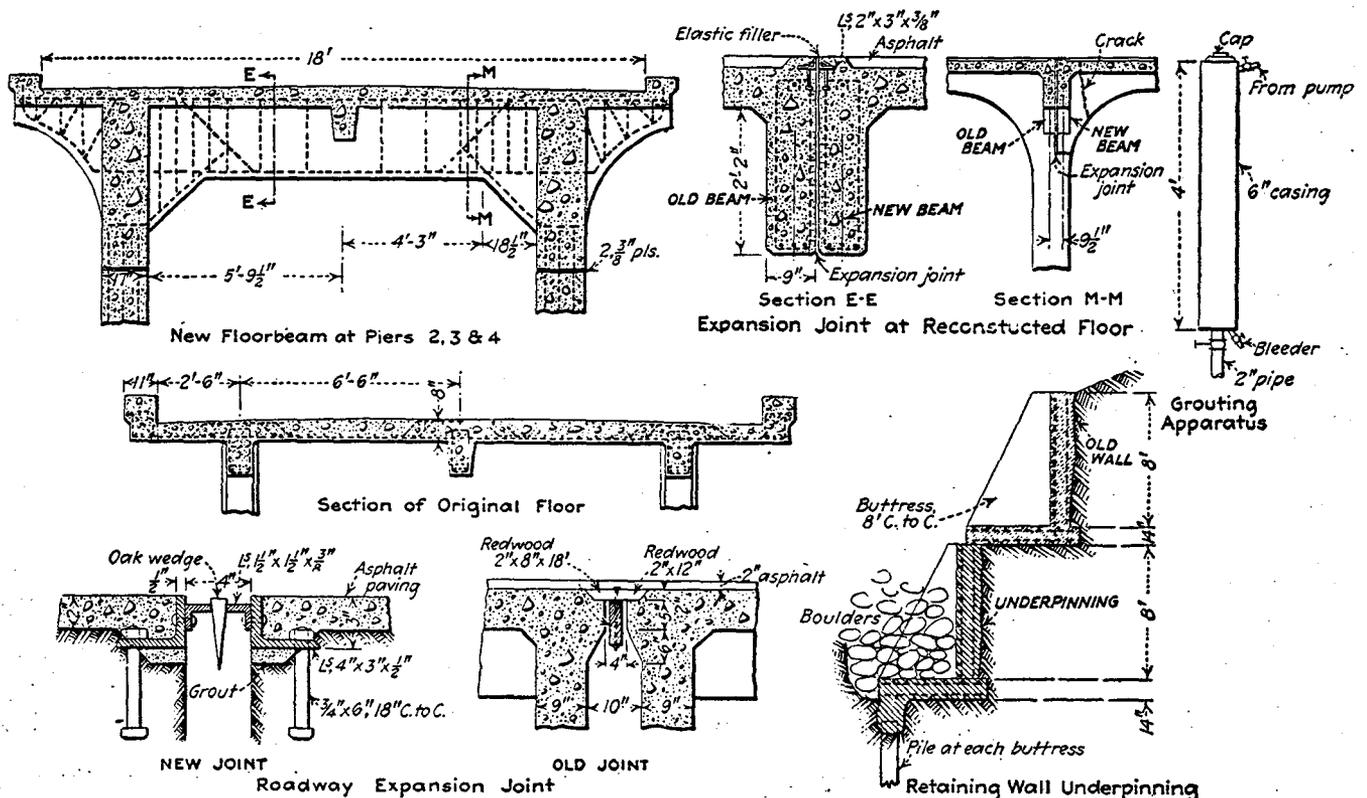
EXPANSION JOINTS AND FLOOR DETAILS, AND REPAIR SKETCHES
